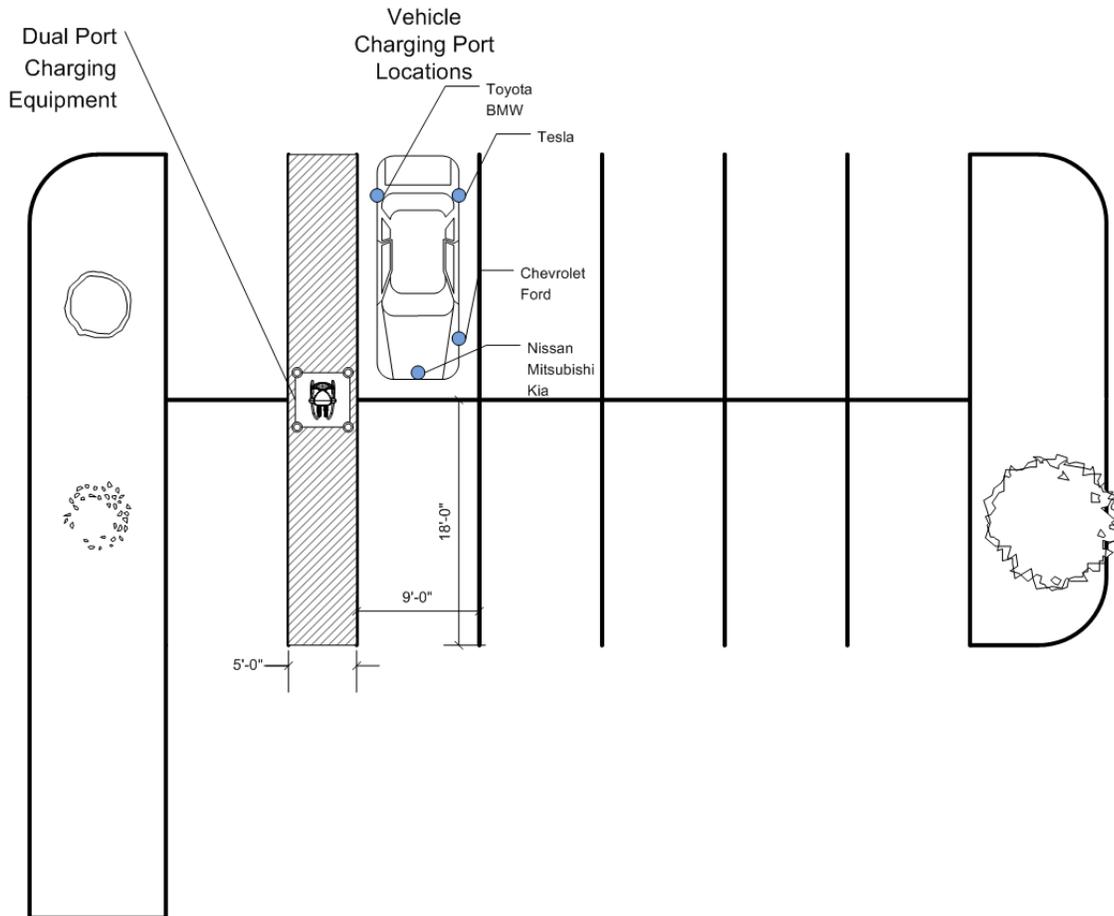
below shows an example layout of EV charging centrally located between parking aisles with the same typical parking stall dimensions of 9 feet wide by 18 feet long. This configuration can serve
